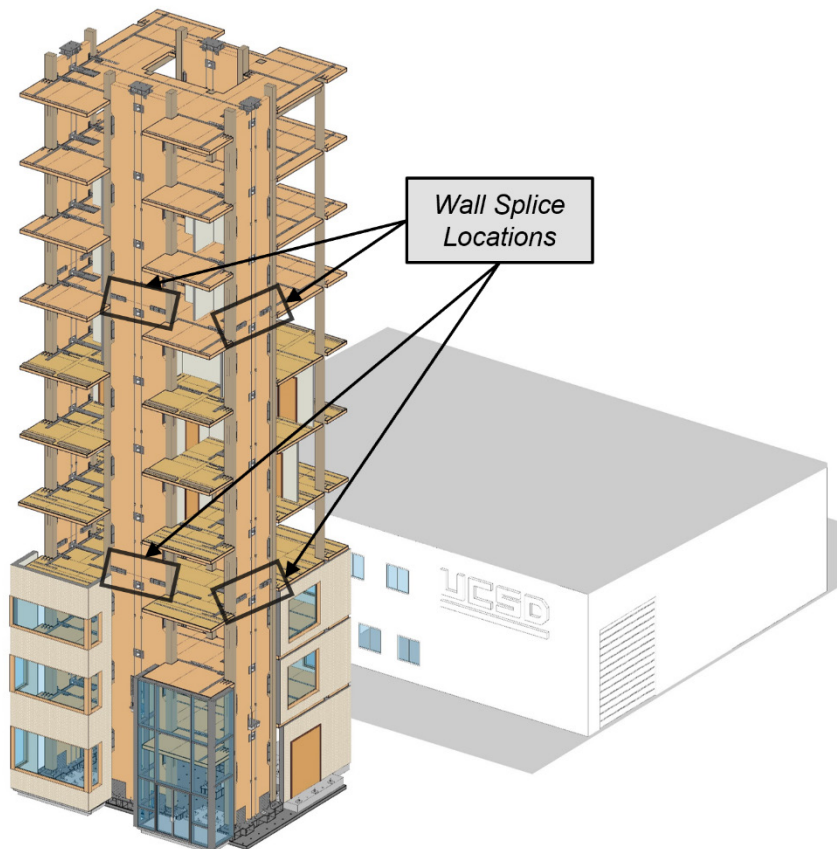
Mass timber wall splice locations along the building height (adapted from Pei et al. 2024).
